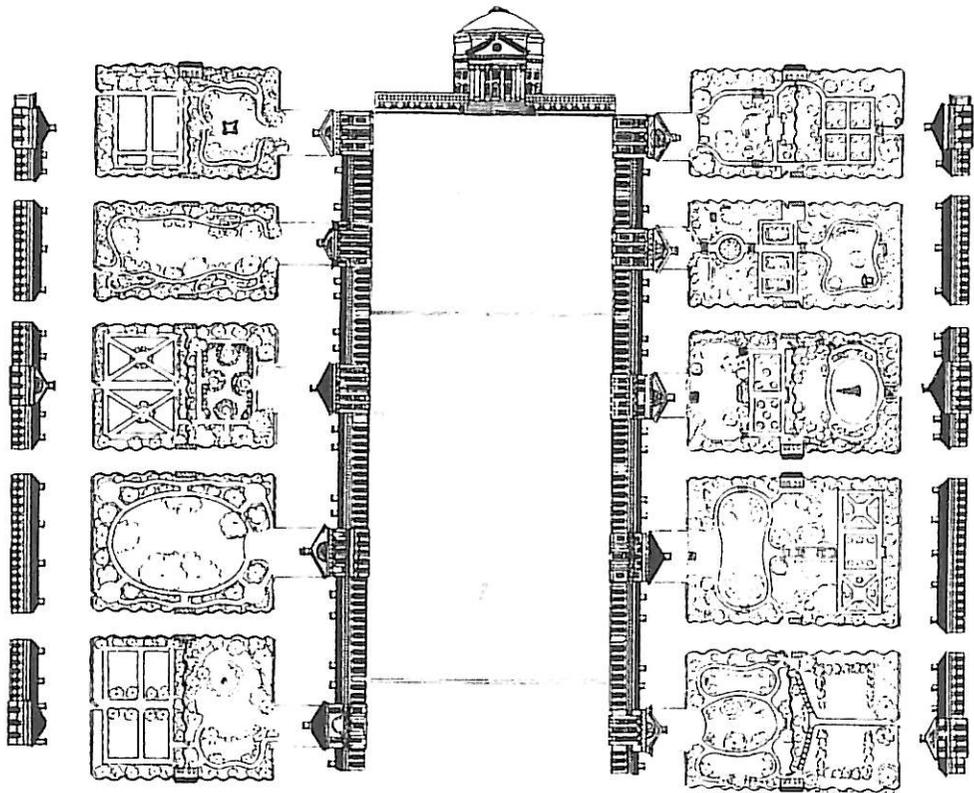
Jefferson's Academical Village and Restored Garden Plans 1952 (Mary Hall Betts)
